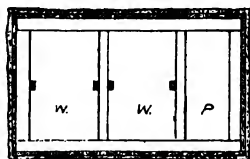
Plan showing Timbering of a Rectangular Shaft
